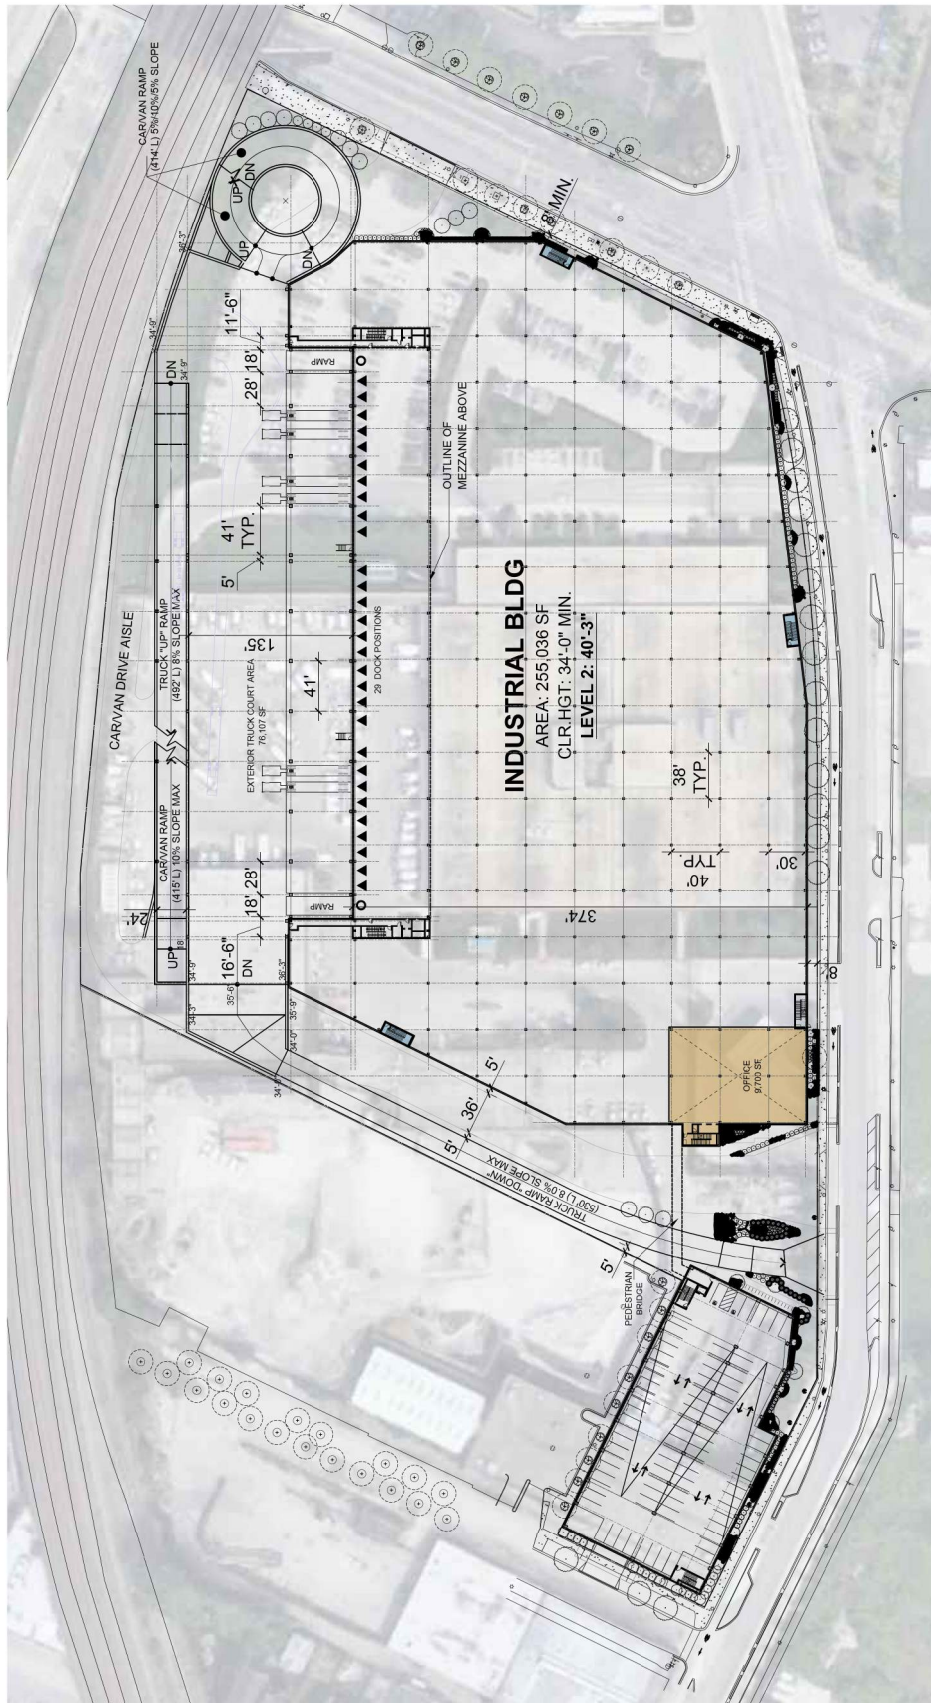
B CONCEPTUAL SITE PLAN LOWER MEZZANINE
